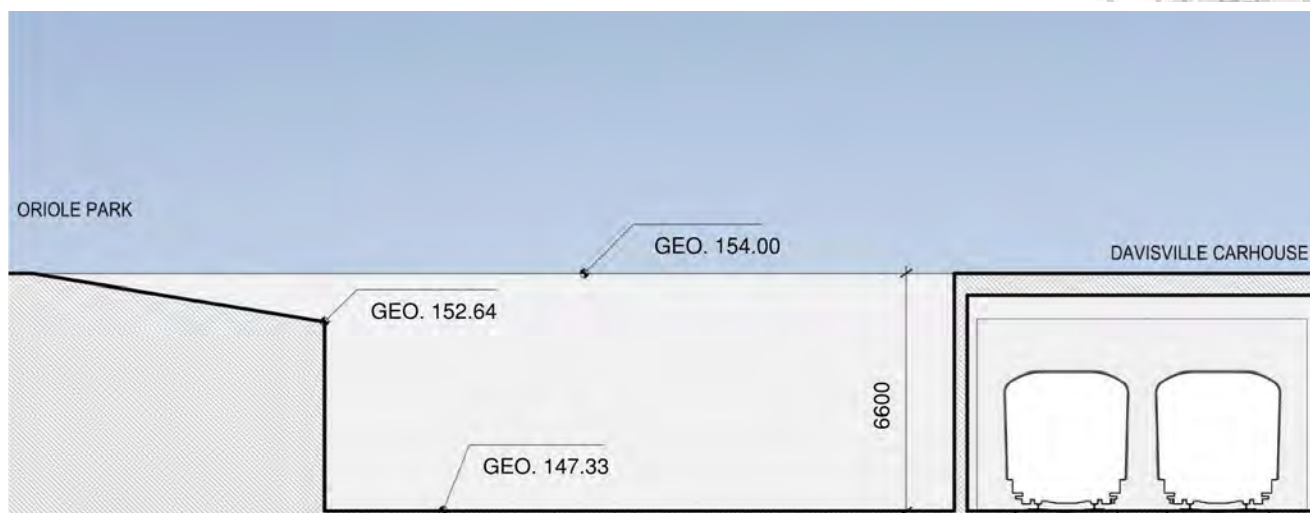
Site section 2- Davisville Carhouse and Oriole Park
